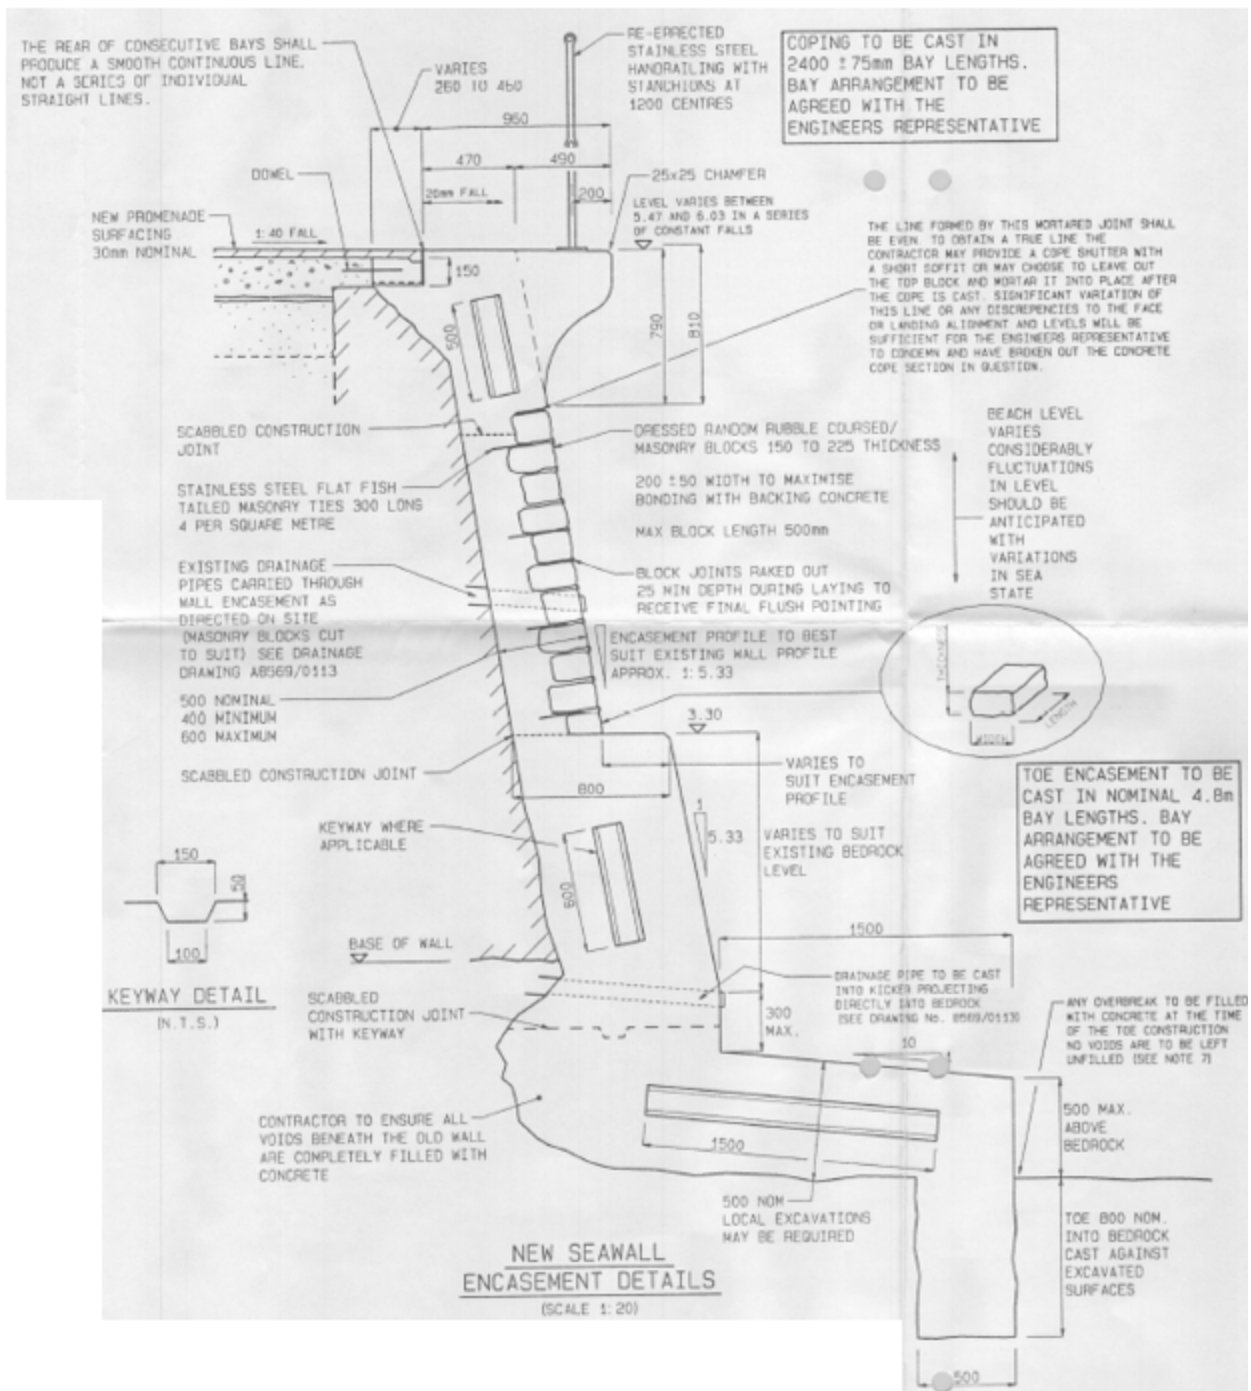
Revised seawall design for flood defence protecting the promenade to the west of Seaton
